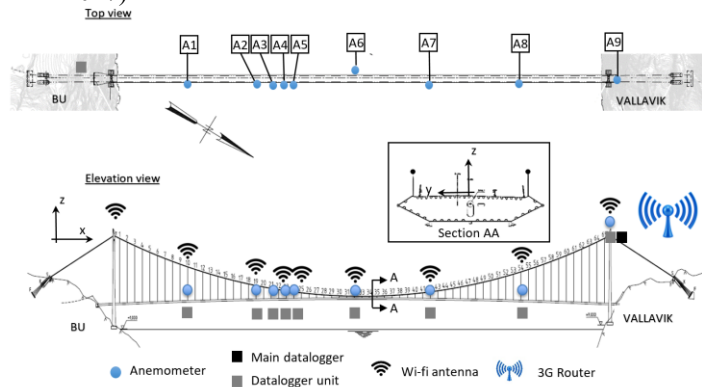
Overview of the full-scale wind measurement system at the Hardanger Bridge
